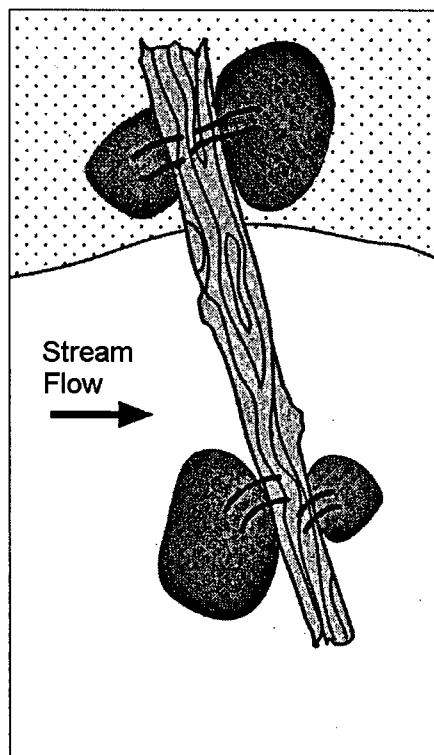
Single-LWD Structure Relying Solely on Boulders for Anchoring (BF=2)
